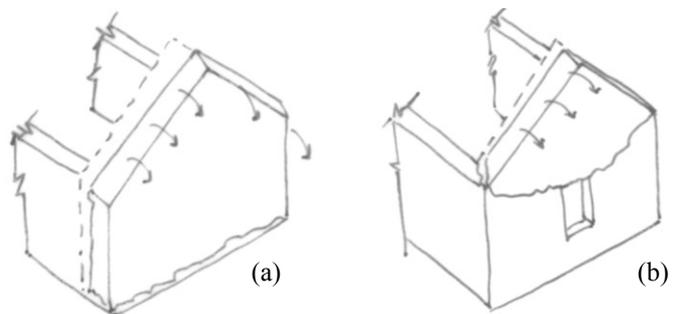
Gable collapse: (a) the overturning at the wall base (b) mid-height collapse
